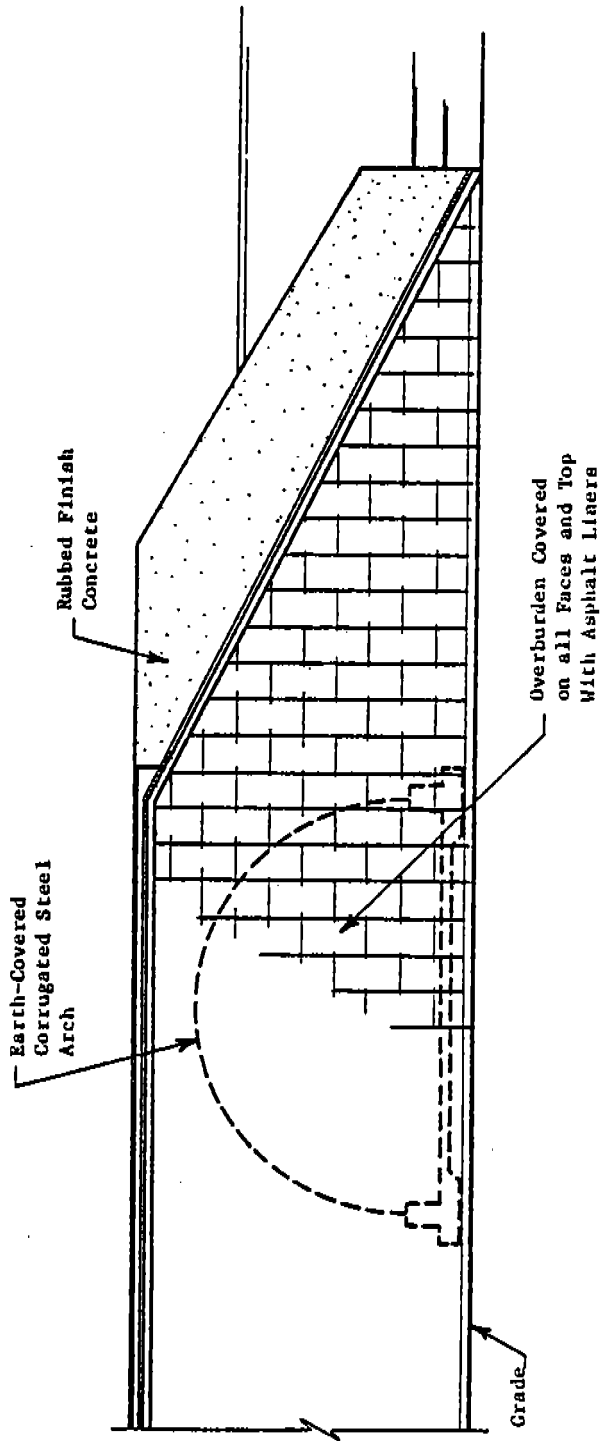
Elevation of Earth-Covered Cubicle in Building 12-65
